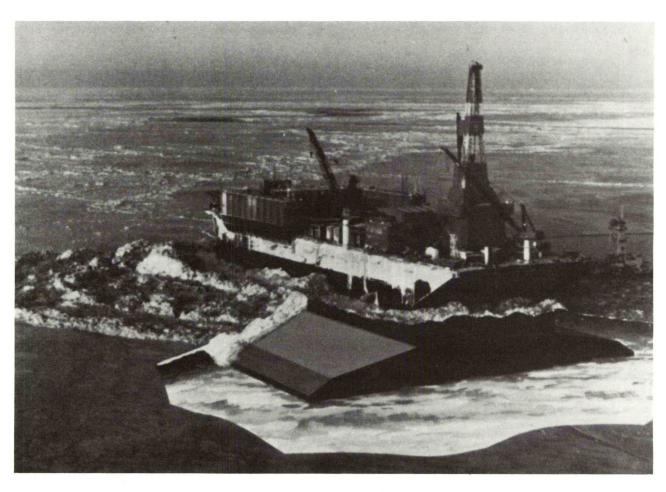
Canmar Single-Steel Drilling Caisson (SSDC) showing artist version of the steel subbase mat.
